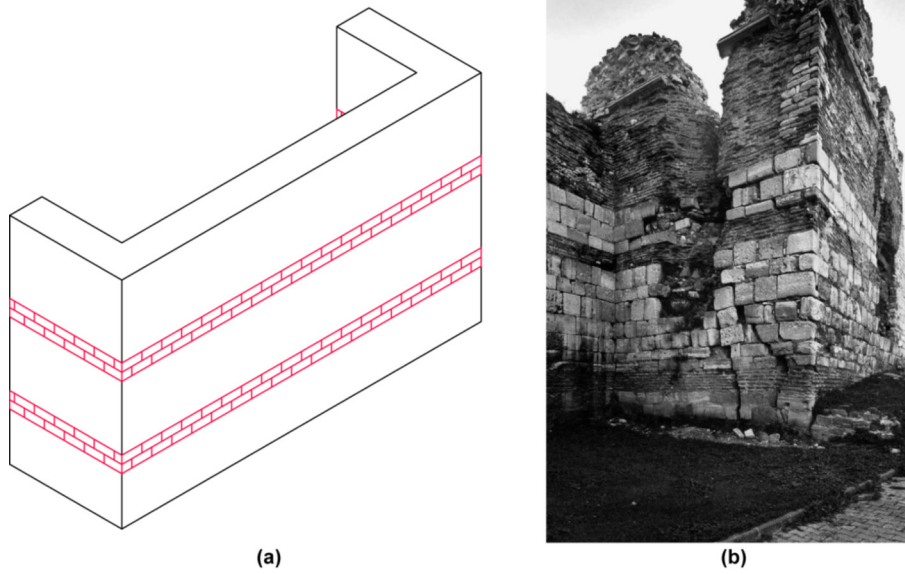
(a) Subdivision of the wall with brick horizontal courses; and (b) original city wall constructed using horizontal brick masonry bands in Istanbul, Turkey [79].
